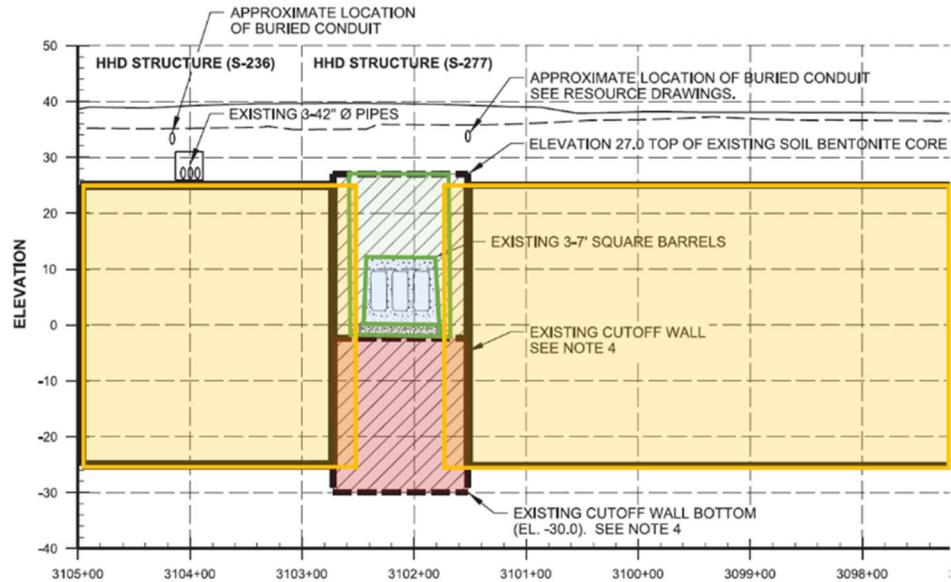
Profile view of structure connection with existing culvert barrels (blue), existing soil-bentonite core (green), existing cutoff wall (red) and new cutoff wall (yellow) (USACE 2018).
